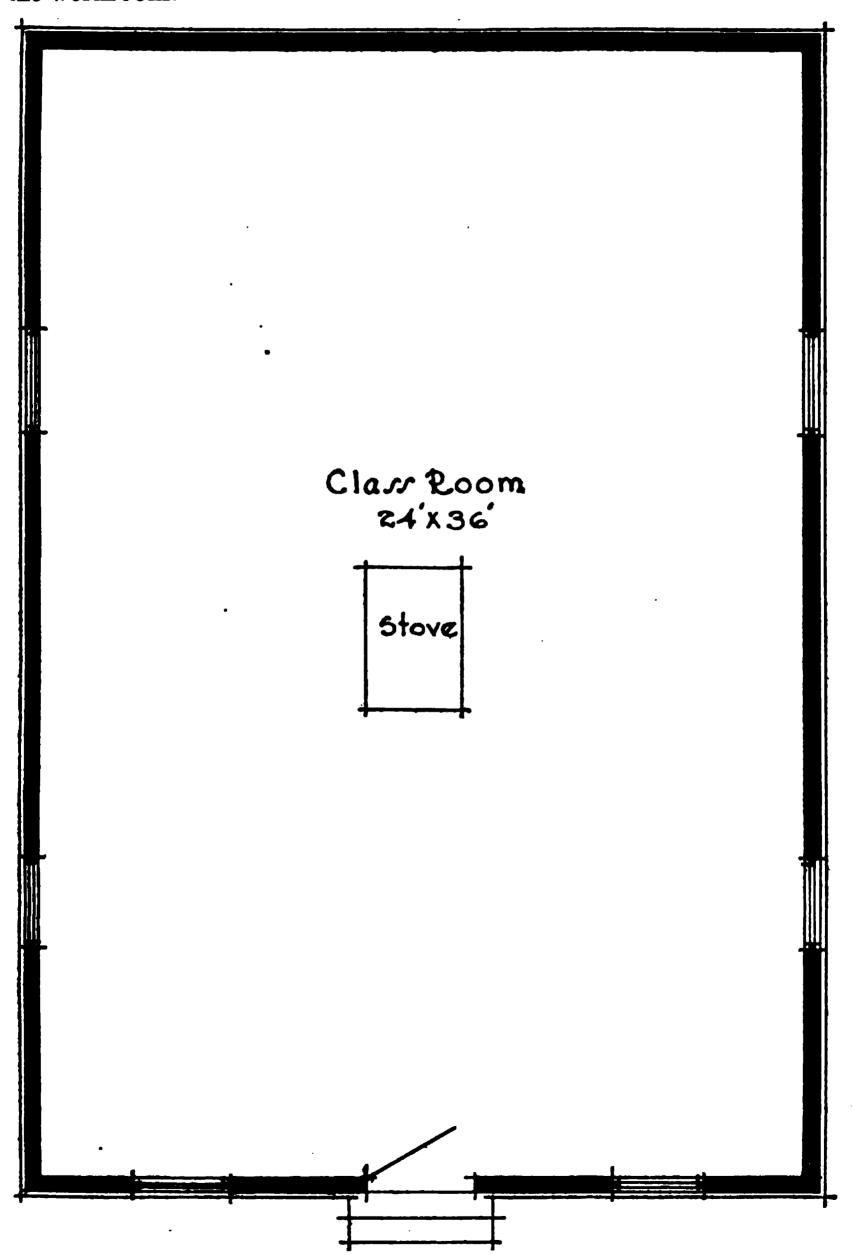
Floor plan of a typical old school building (see also p. 115).
